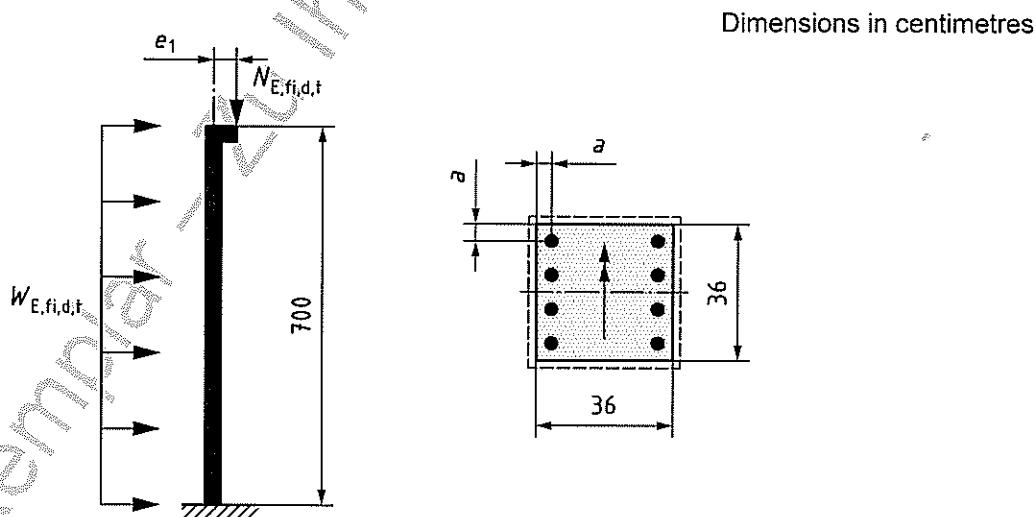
Reinforced concrete cantilevered column — cross section and system
